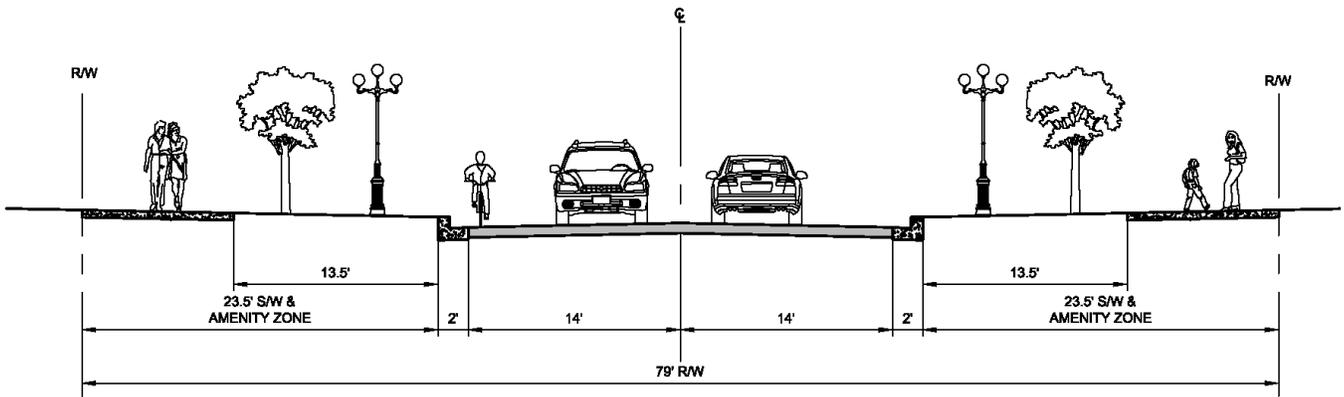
West Army Street (between Water Street and Market Street) Typical Section
